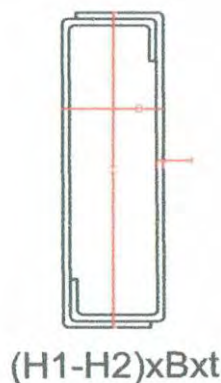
Section through the tapered box beam. Design courtesy of Steltech NZ.
